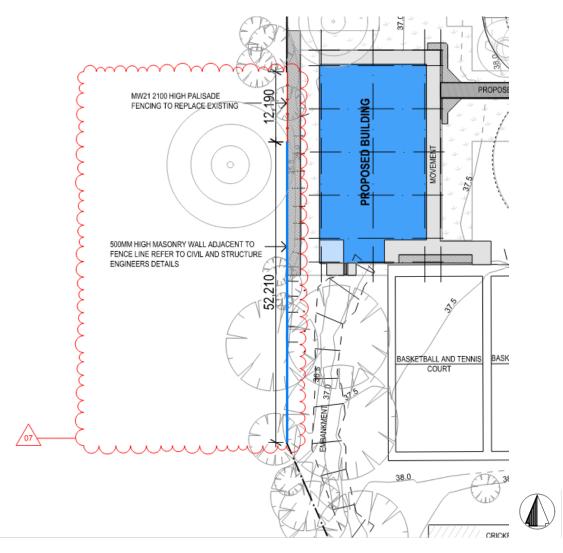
Proposed Site Plan – Fulton Trotter Architects
